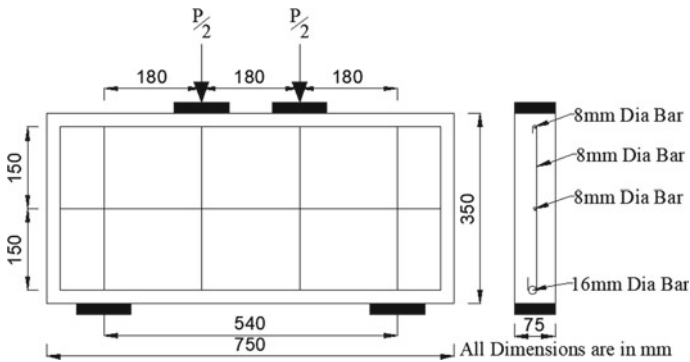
Typical dimensions and reinforcement details of the test specimen
